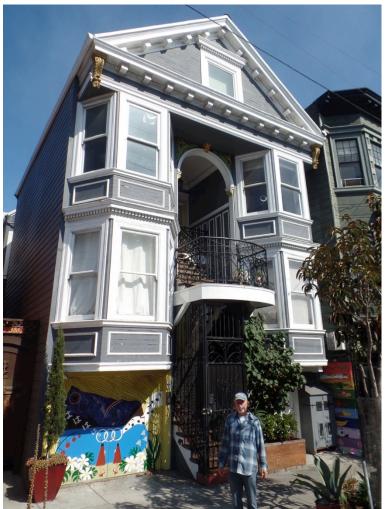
West elevation view of building looking SE. Ground level is considered a soft story (Garavaglia Architecture, 2022).
